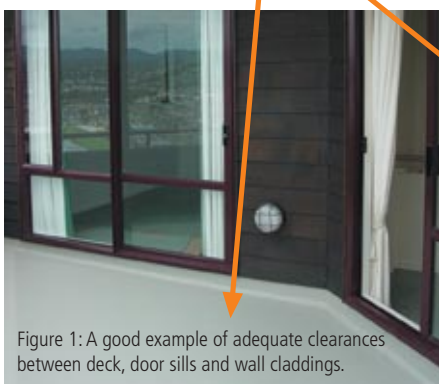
A good example of adequate clearances between deck, door sills and wall claddings.
